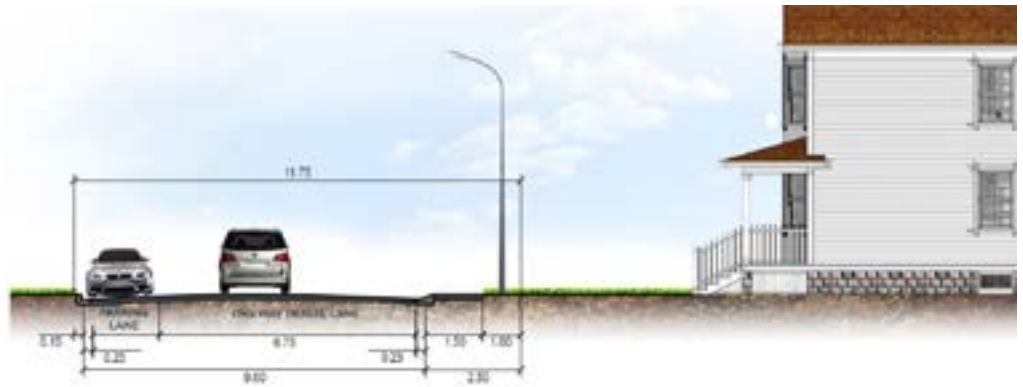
15.0m/16.0m/17.6m Local Roadway Cross-Section
